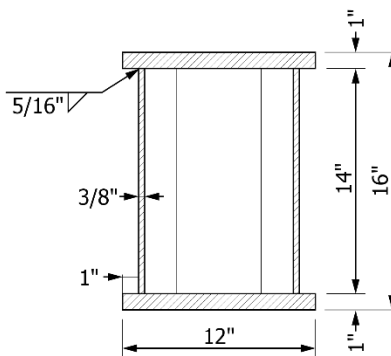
Pilot Specimen dimensions (elevation and cross-section)
